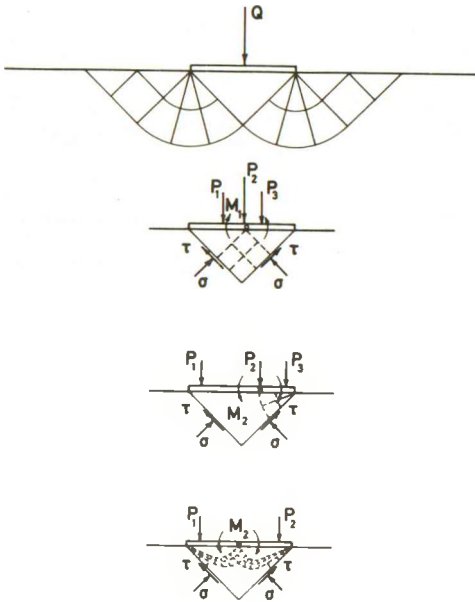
B: Rupture Figures on the Verge of Failure in the Rigid Body Below a Strip Foundation.
